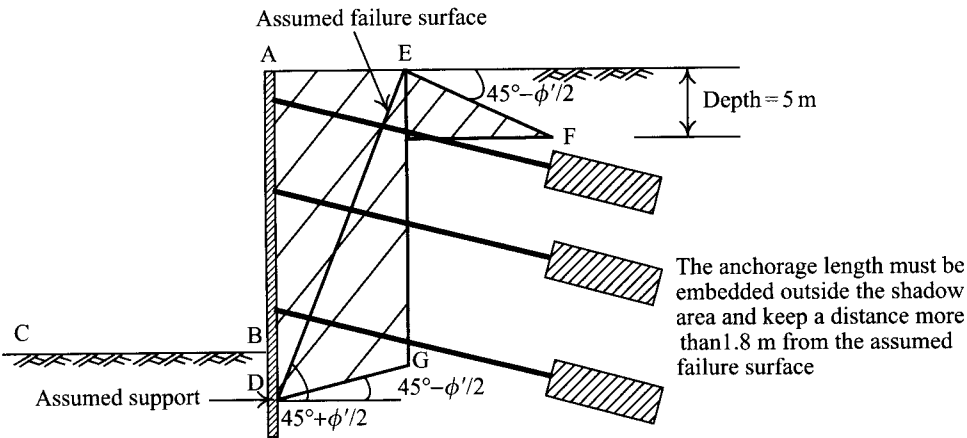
Locations of the anchorage sections in soil (redrawn after BSI, 1989).
